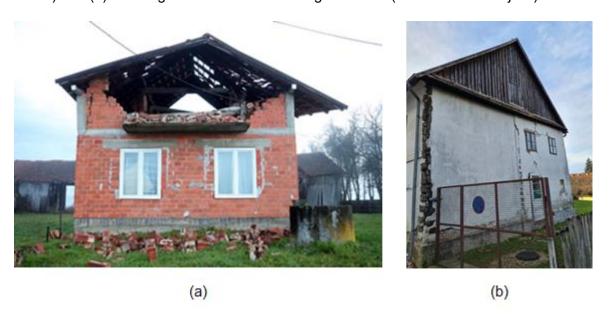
Performance of gable walls: (a) collapsed gable wall in a partially confined masonry building (with discontinuous RC tie column) and without a RC ring beam along the wall-to-roof interface (source: Sanjin Strukic/Pixel) and (b) good performance of a gable wall in a form of light-weight wooden panel (source: Nenad Bijelić).
